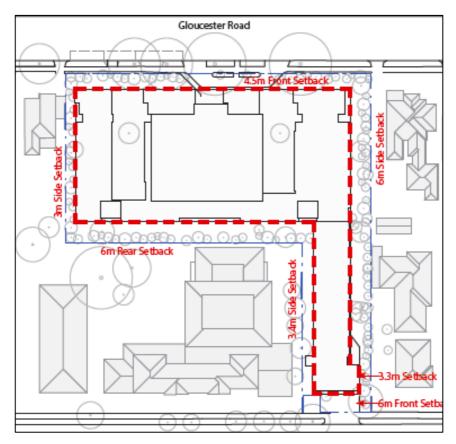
Proposed Setbacks and Building Separation Source: O'Neill Architecture
